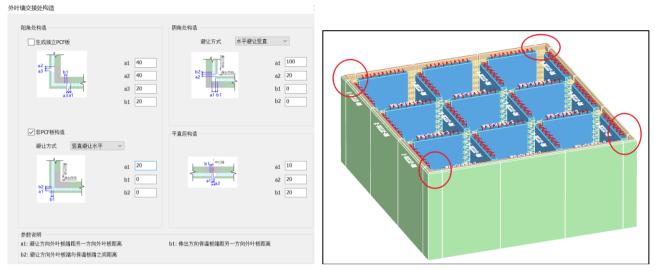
Wall horizontal connection node design in YJK's built-in prefabricated building design software.
